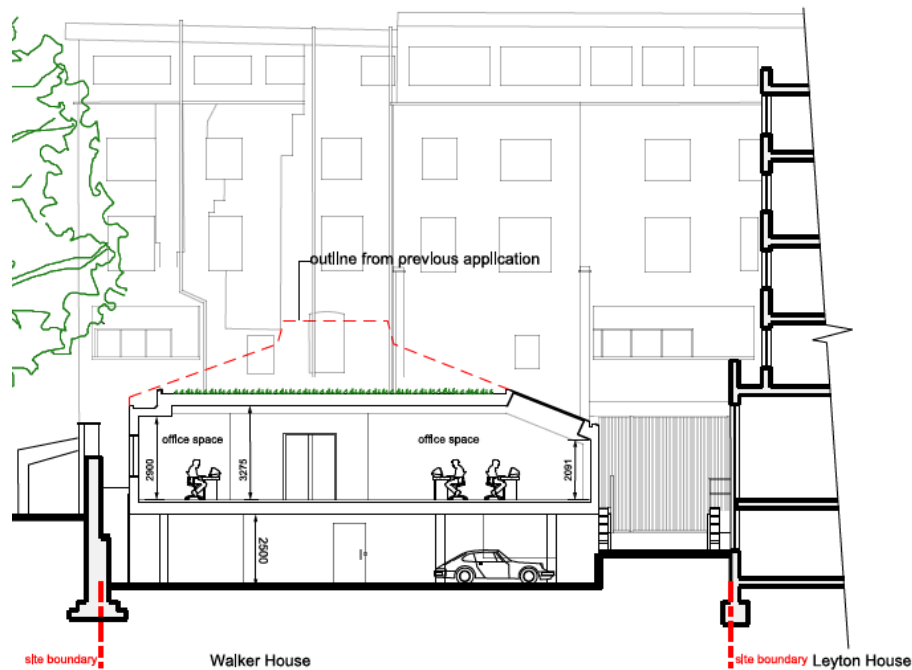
Section of proposal with lower ground and ground of Leyton House (22 Calvert Avenue) on right. Outline of previous scheme indicated in red.
